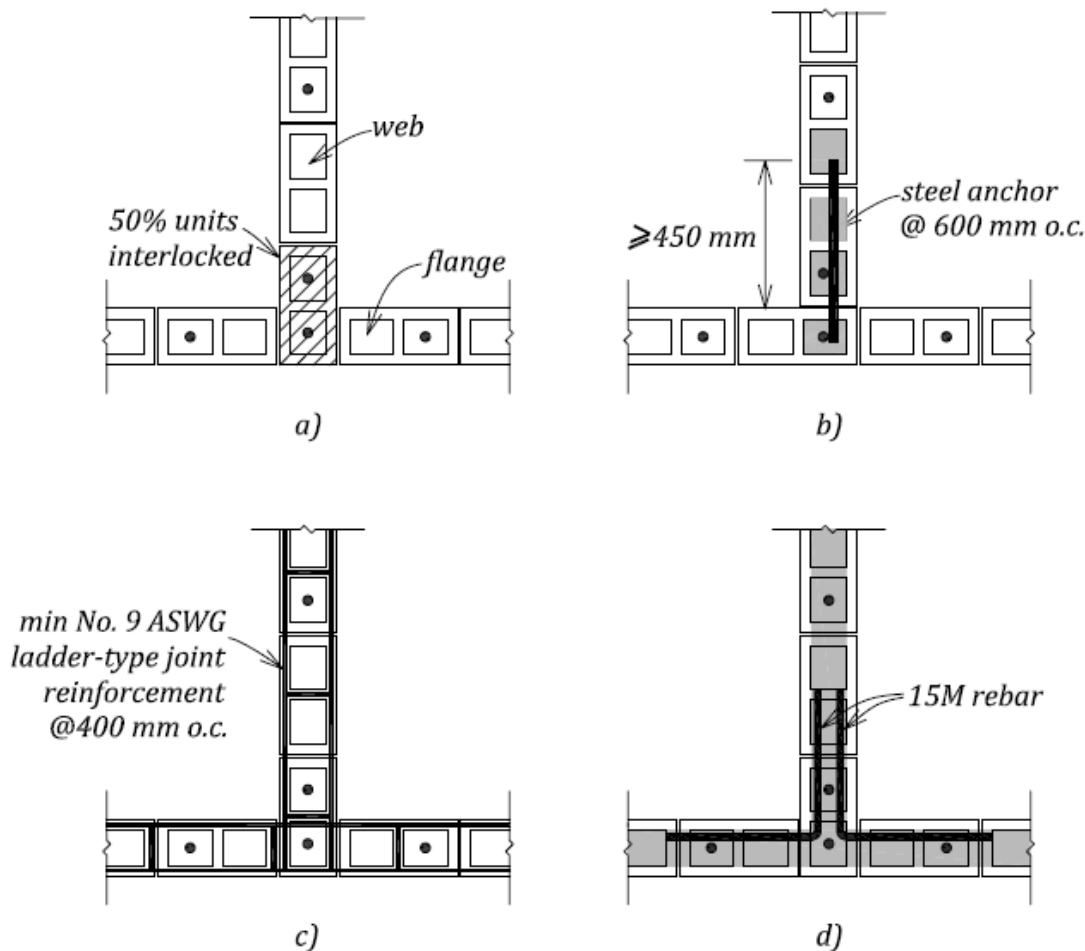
Masonry wall intersections: a) bonded intersections; b) mechanical connection; c) horizontal joint reinforcement; d) horizontal reinforcing bars (bond beam reinforcement).
